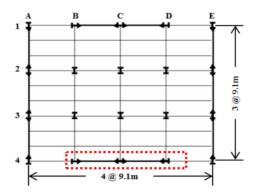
Plan of the four-story steel moment frame building (adapted from [1])
